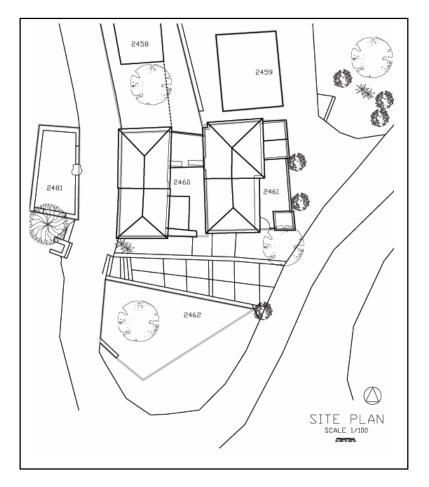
Site plan of Yenigün and Çarboğa Houses
